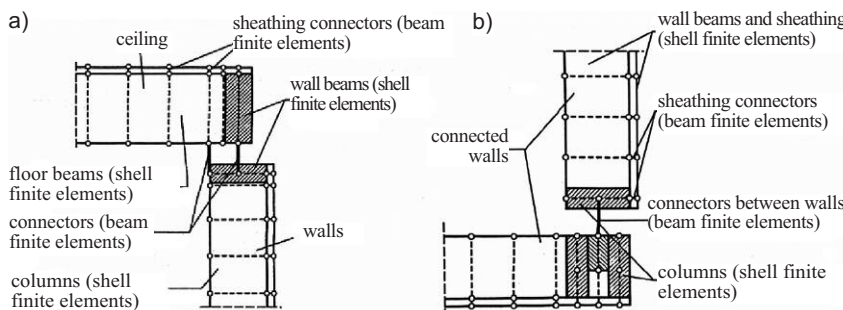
Theoretical FEM model of the connection: a) walls; b) walls and floor slab [6]
